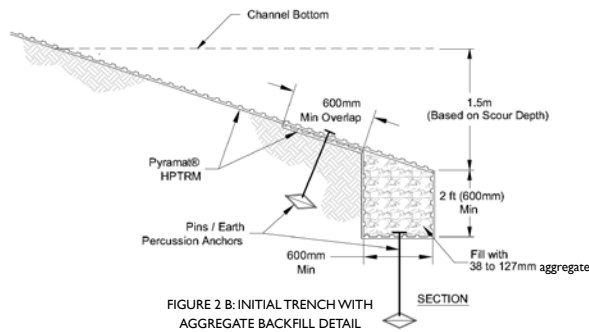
B: INITIAL TRENCH WITH AGGREGATE BACKFILL DETAIL
